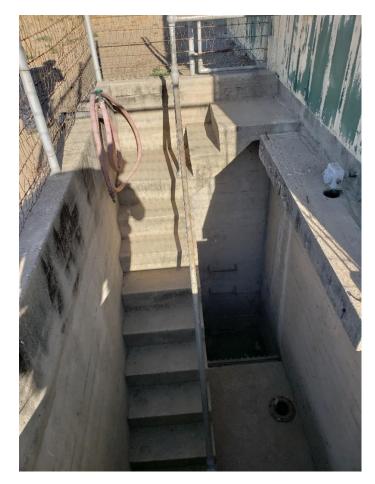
Eleventh Street Lift Station Wet Well and Lower Access
